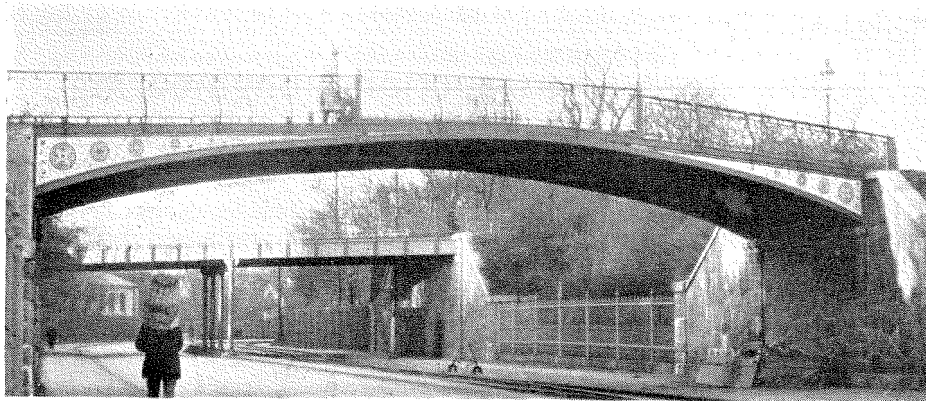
Reinforced Concrete Bridge built in Copenhagen in 1894.
